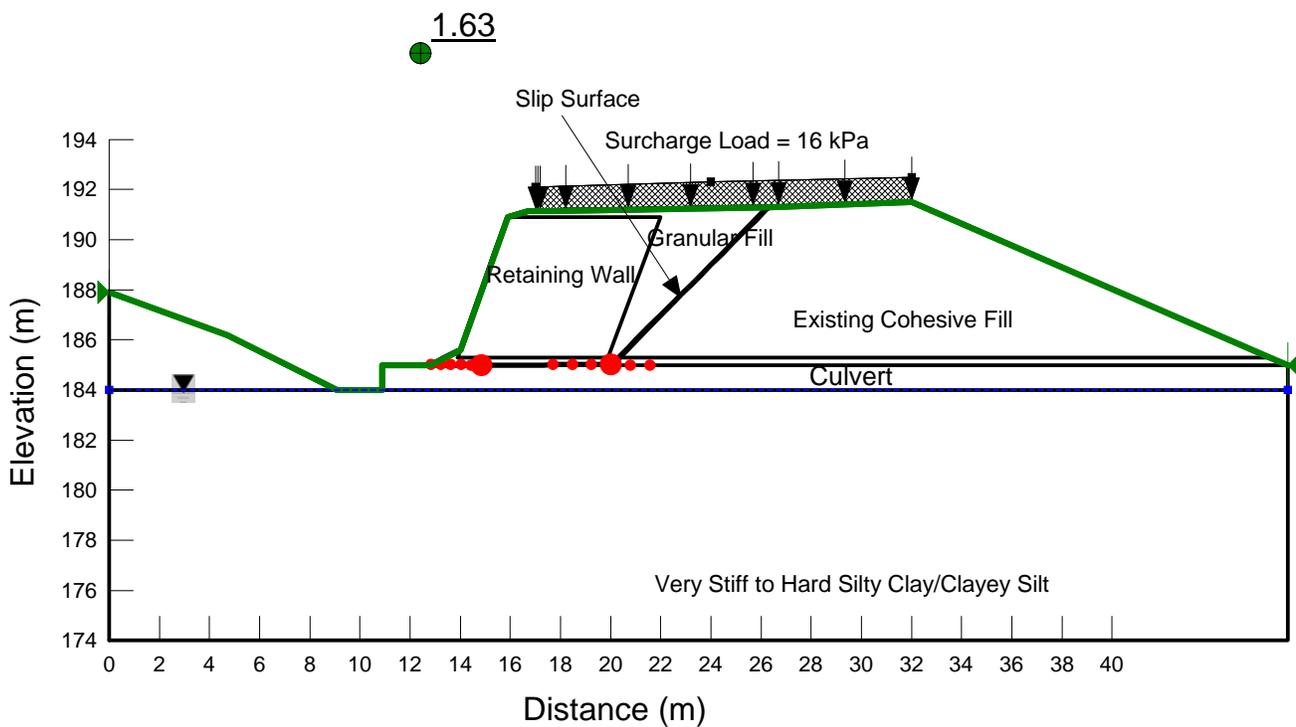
Slope Stability Analysis of Proposed Retaining Wall - Sta. 10+267
